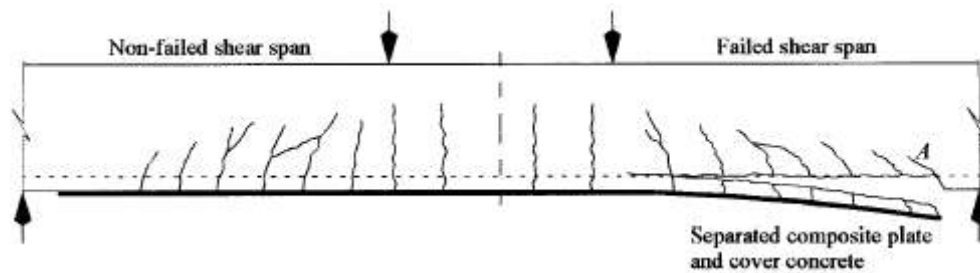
Concrete Cover Delamination (Garden and Halloway 1998)
